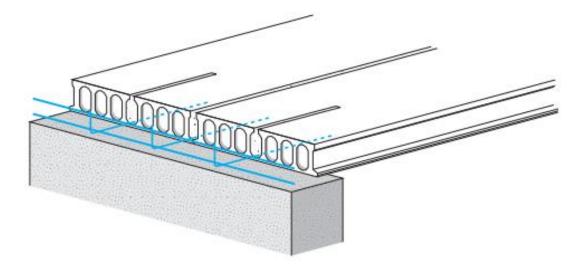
Example of reinforcement in the connection between hollow core slab and supporting beam [8].
